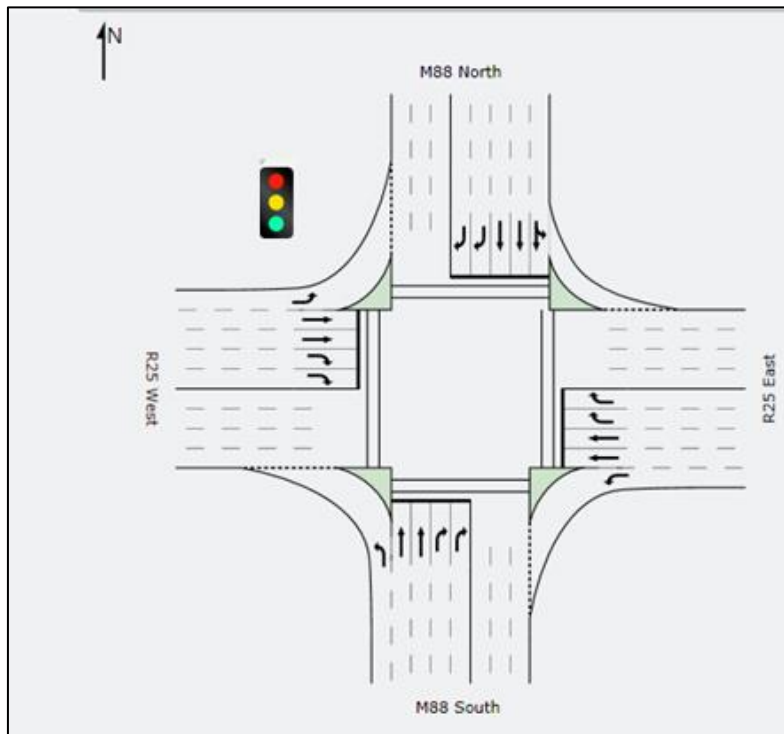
Proposed upgrade for the intersection between M88 ( Rienert Avenue) and R25
